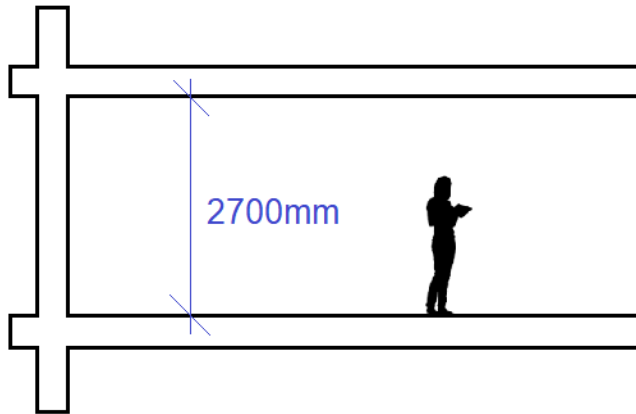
Minimum floor to ceiling heights for boarding house and co-living housing
